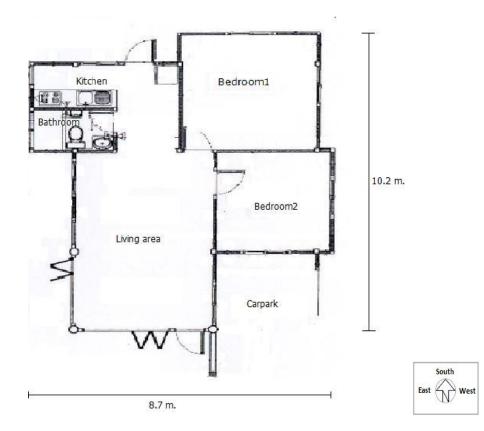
Floor Plan of Typical Housing Model (Department of Alternative Energy Development and Efficiency, n.d.)
